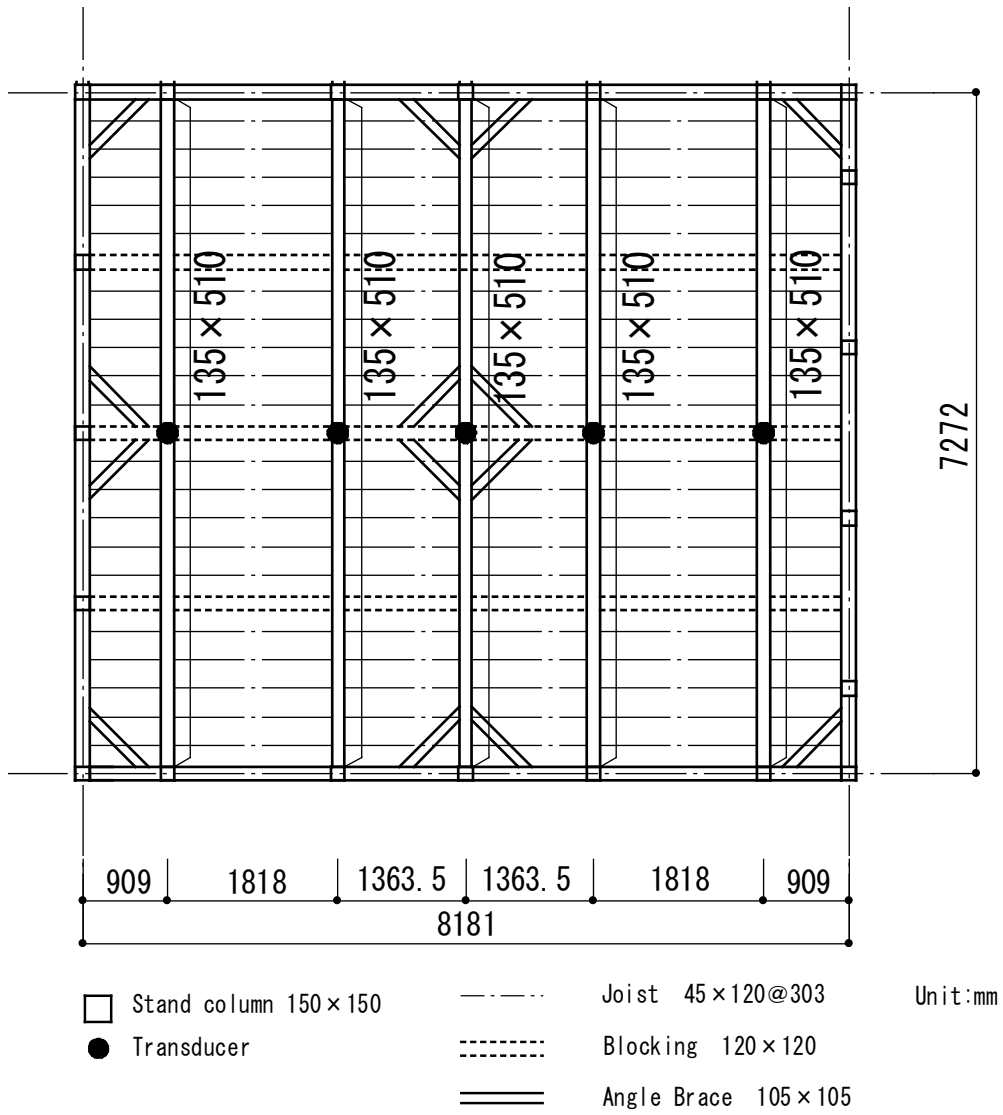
Upstairs floor framing plan of a measured room in elementary school C.
